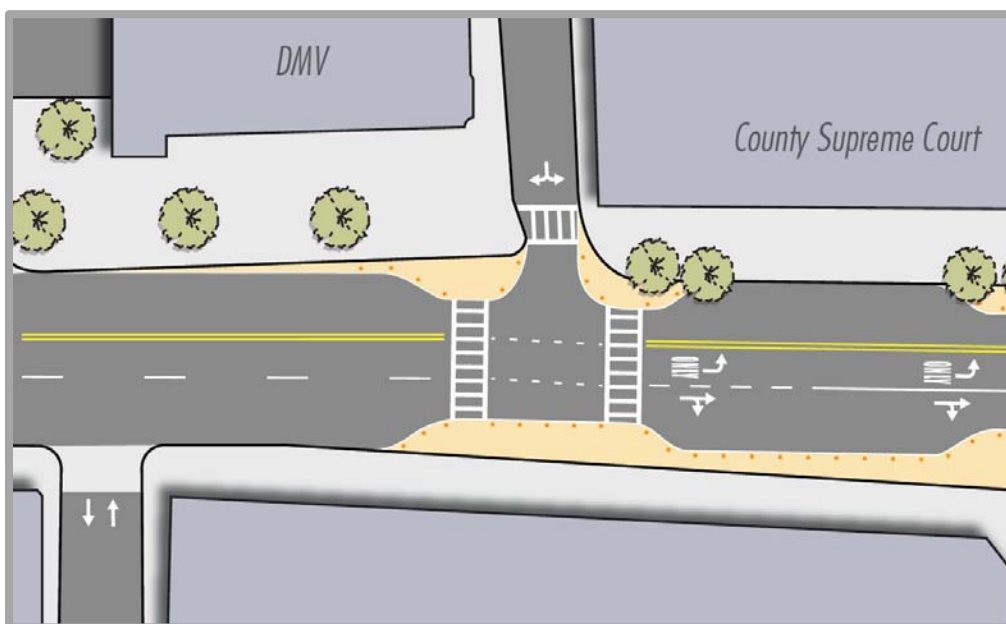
Intersection of Market Street and County Office Building Driveway in a two-way Market Street scenario.
